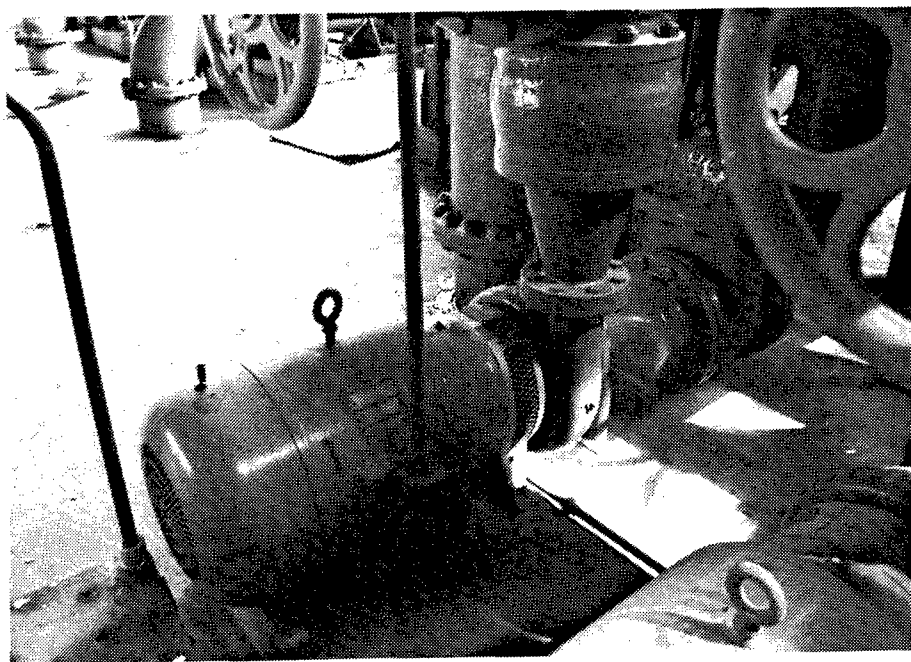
Building 409: Pumps at the Water Filtration Plant.
